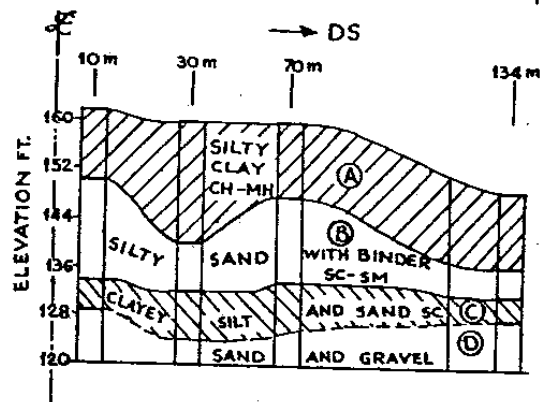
SOIL PROFILE OF DAM FOUNDATION
